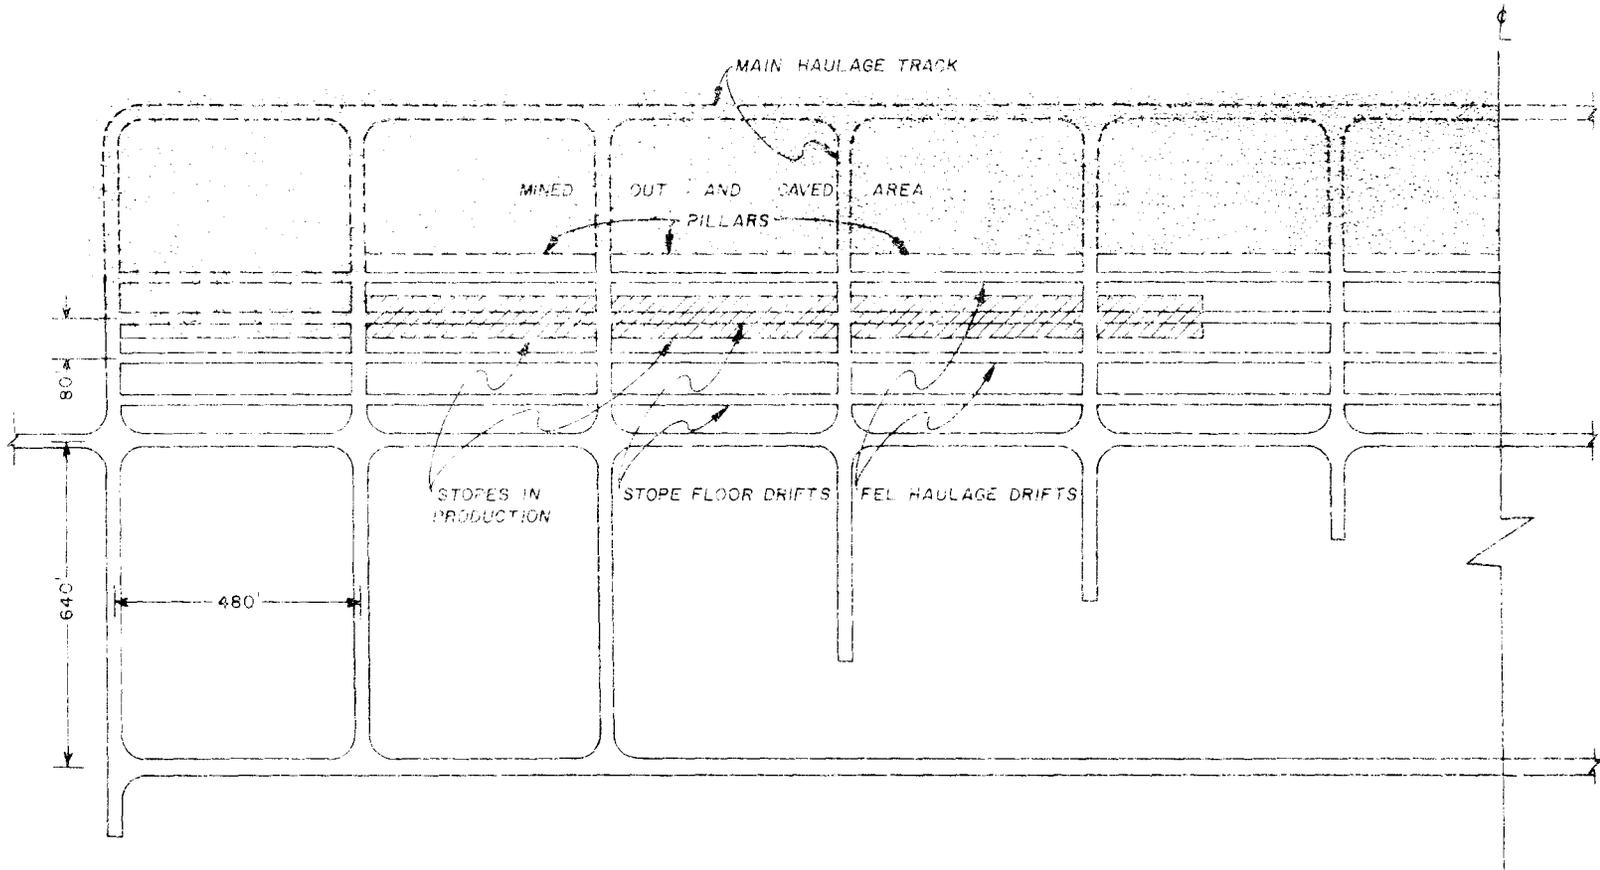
Rail Haulage Layout, Sublevel Stoping with Full Subsidence
